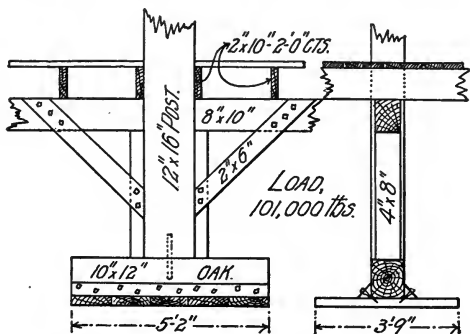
Timber Grillage Foundation, Fisheries Building, World's Columbian Exposition.
